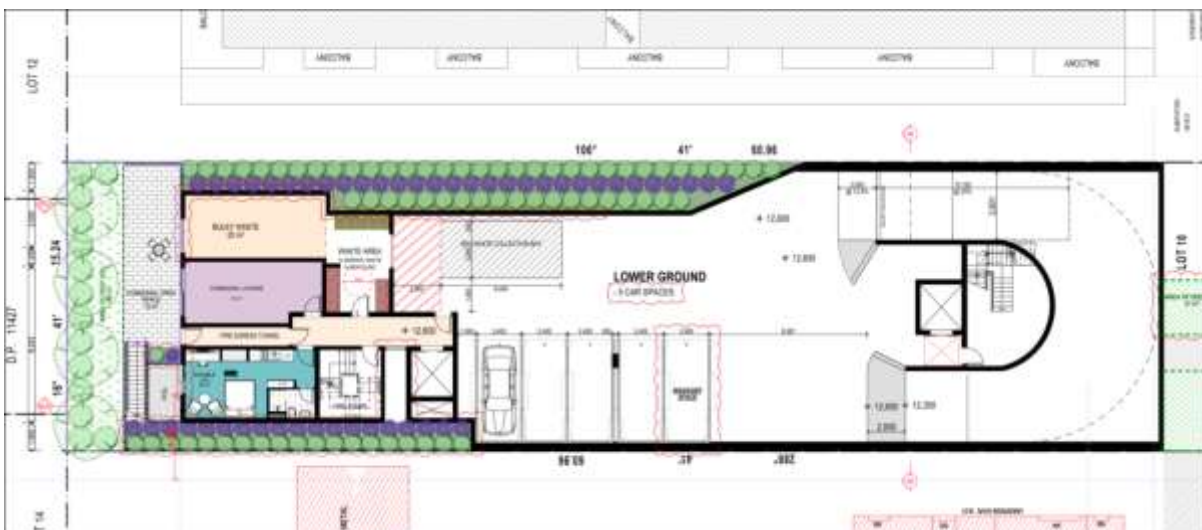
LEC approved lower ground plan - DA 2021/106 (LEC No. 2020/250687)
